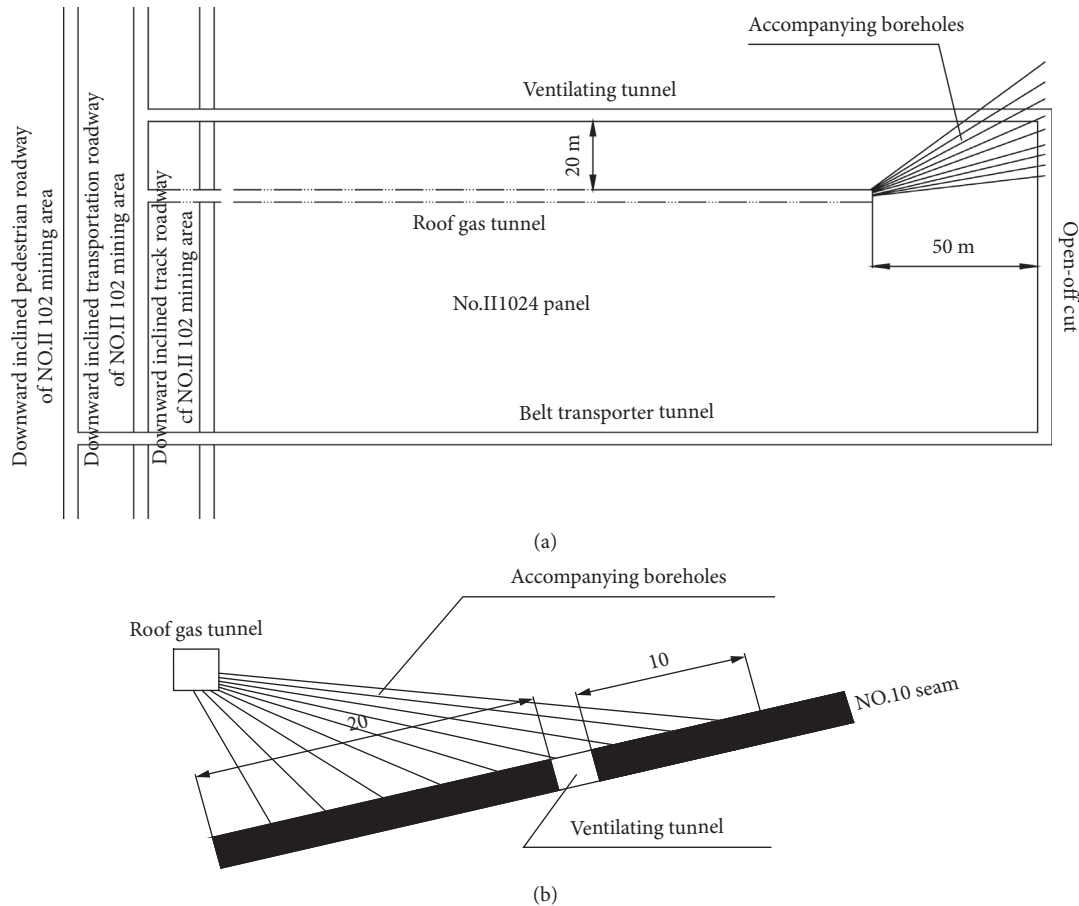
Roof gas drainage roadway and accompanying boreholes in No. 2 1024 panel: (a) plan view; (b) vertical cross section.
